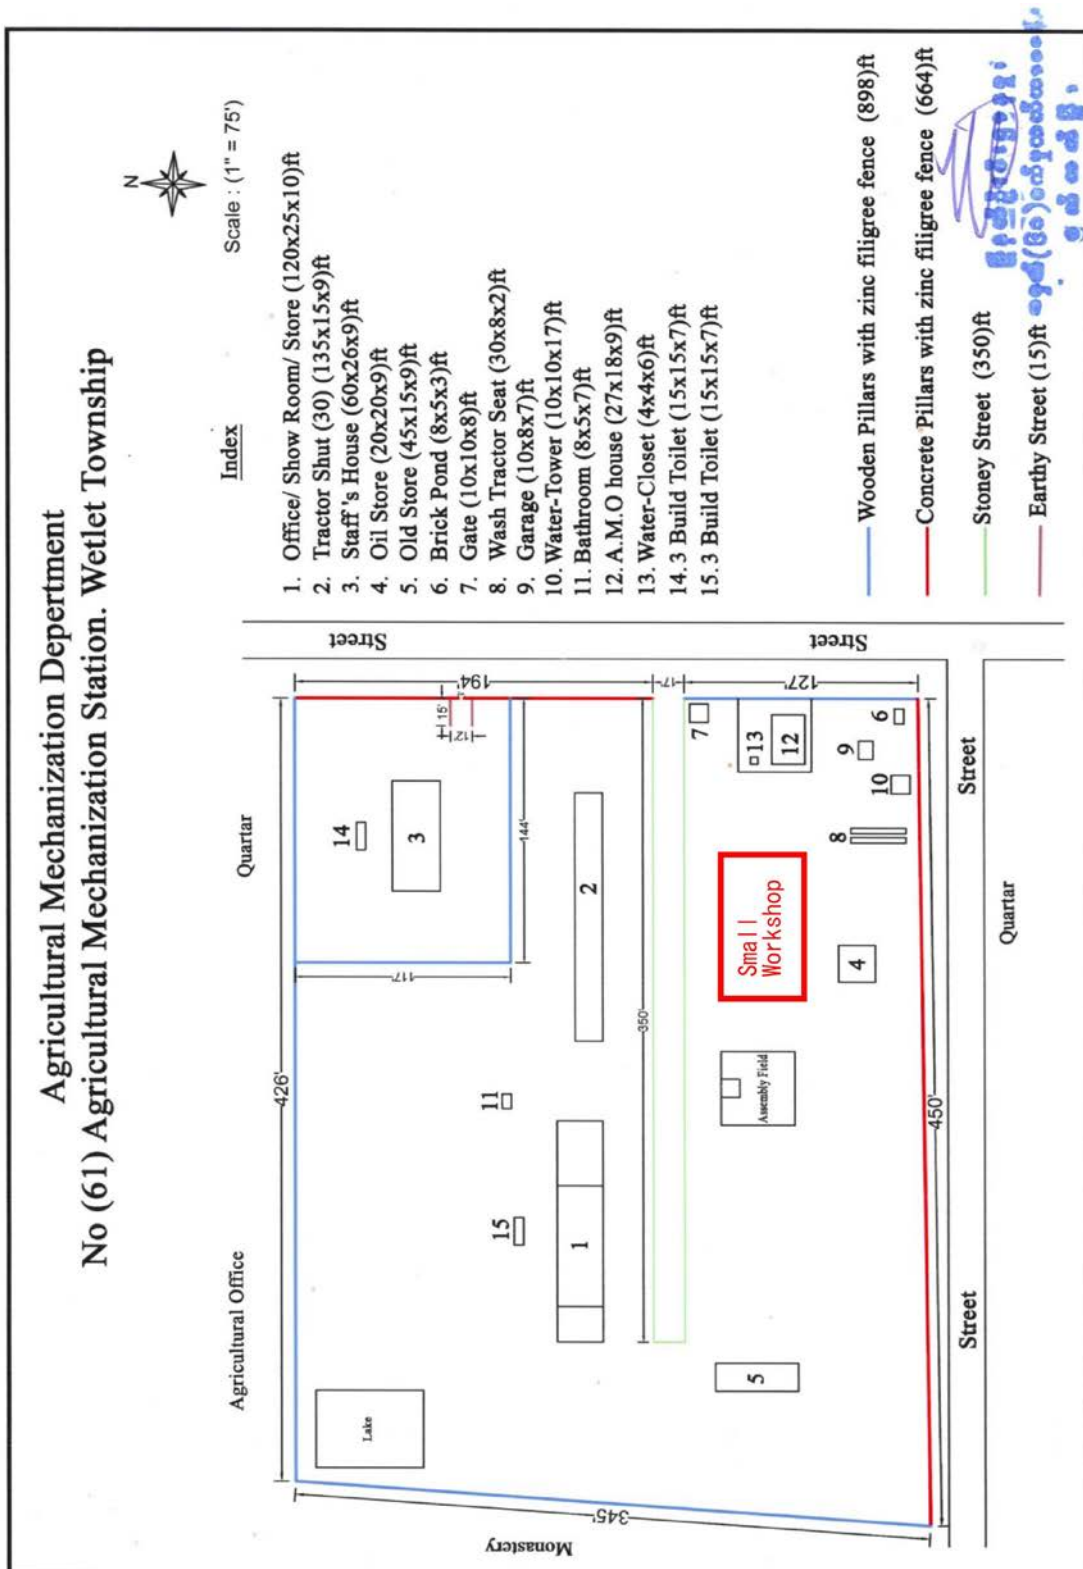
Site Plan of Small Workshop at AMS No.61 (Wetlet)
